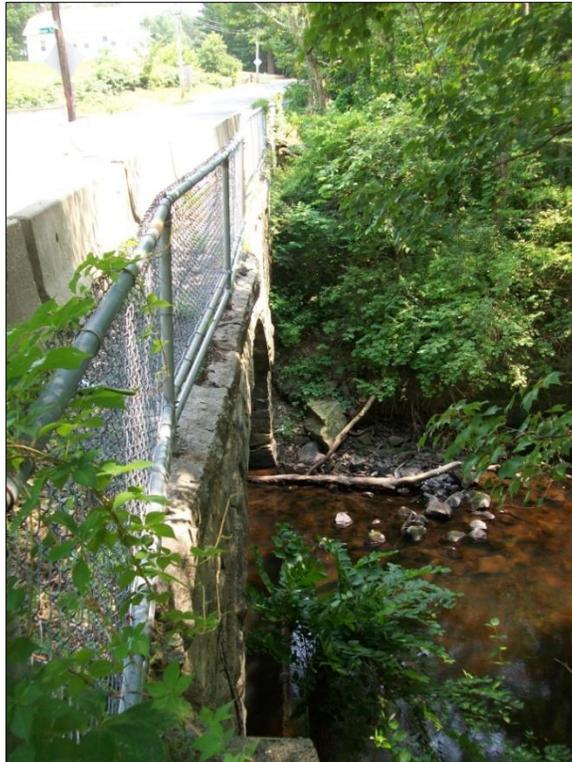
Looking South: Displacement of Top of West Spandrel Wall and Fence
